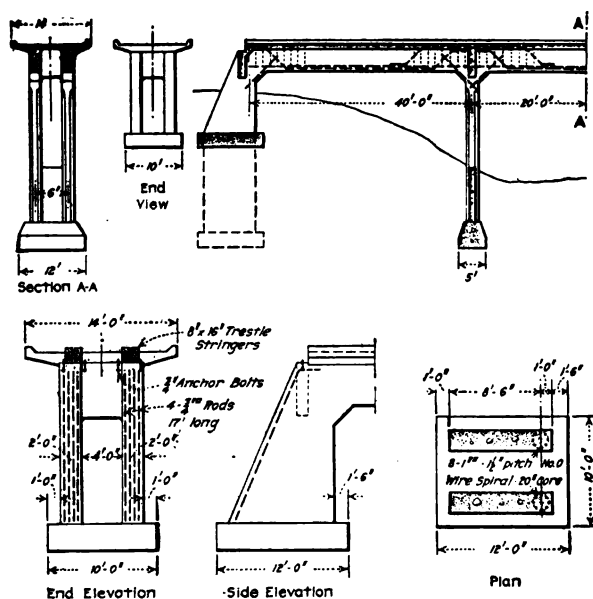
Details of railway bridge over White Rock Creek near Dallas, Texas.
